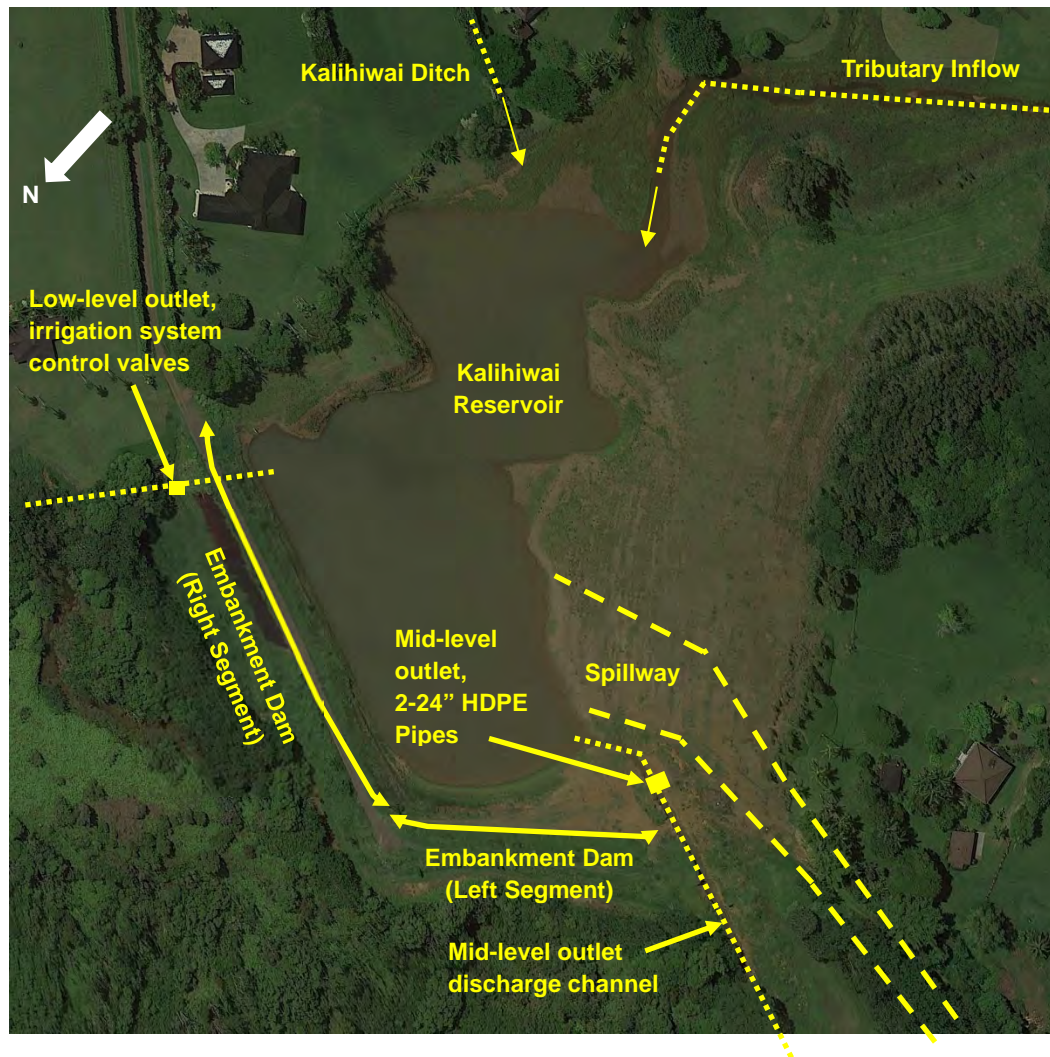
Aerial View of Dam and Appurtenant Structures
